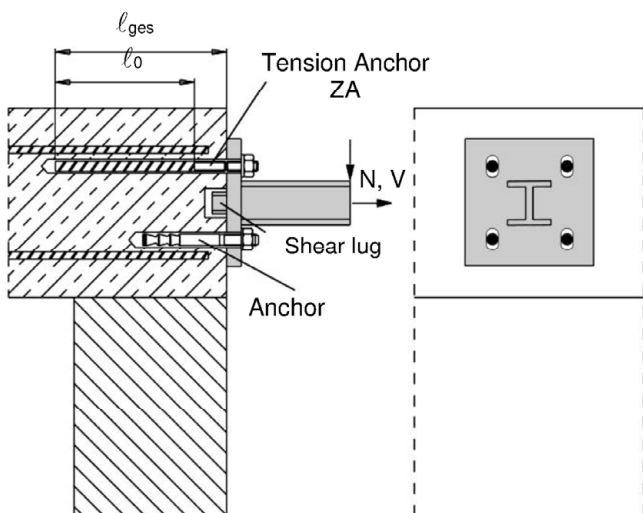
Overlapping joint of a column stressed in bending to a foundation
